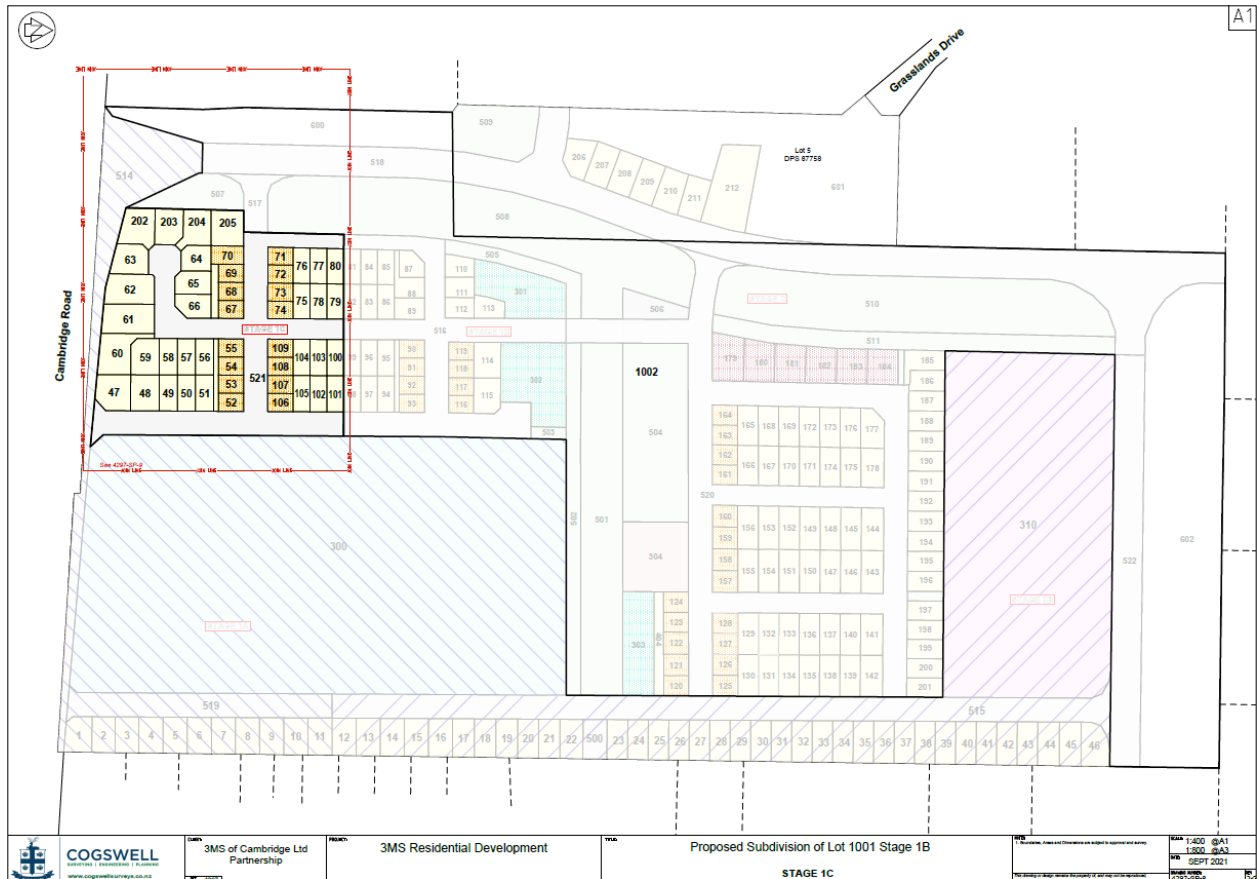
Proposed scheme plan showing extent of Stage 1C.
